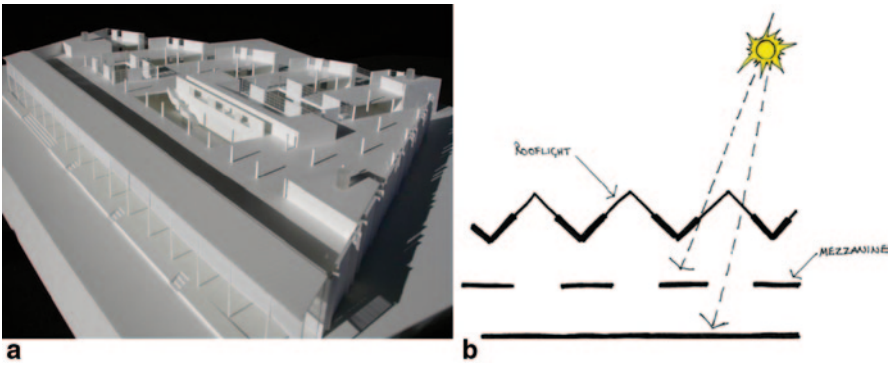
a Model showing the first floor with the central atrium, two courtyards and the mezzanines to the north side of the office. b The concept sketch from the interview shows daylight to both floors
